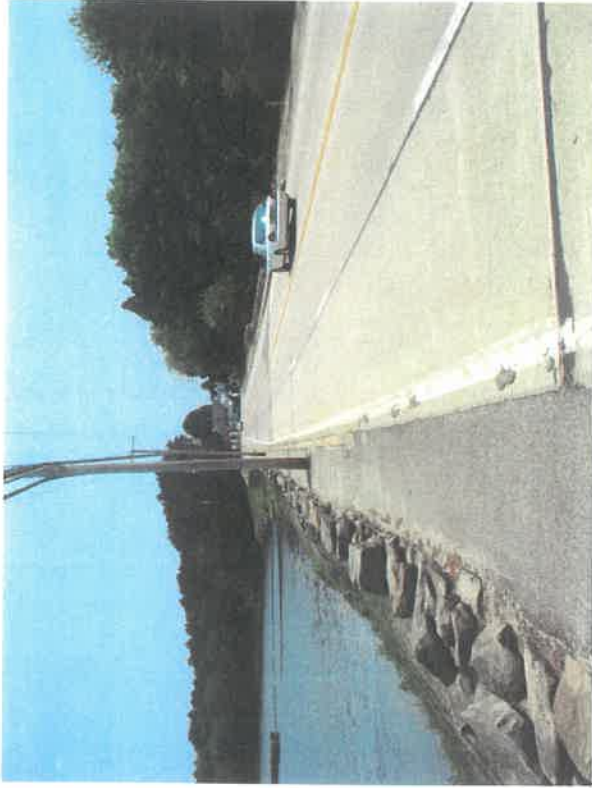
Looking at Horseshoe Dam road embankment (Danielson Pike) from right abutment
